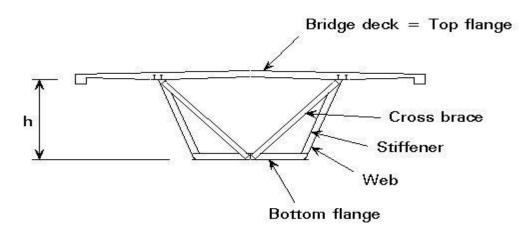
Typical components of a box girder bridge with composite concrete deck
